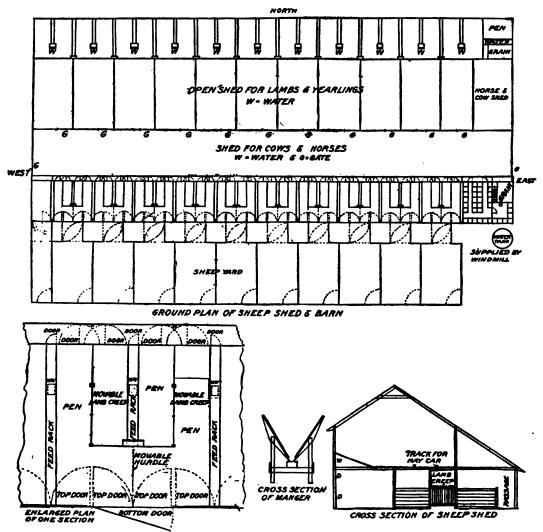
A UTAH SHEEP SHED (ARRANGEMENT AND CROSS-SECTION).
